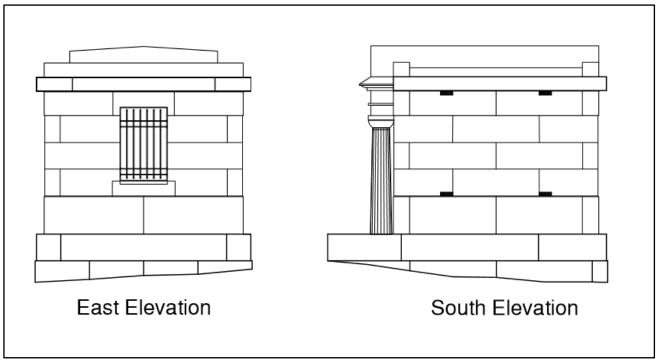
Scale drawings of the south and east elevations. It shows the parapet and slope of the roof.
